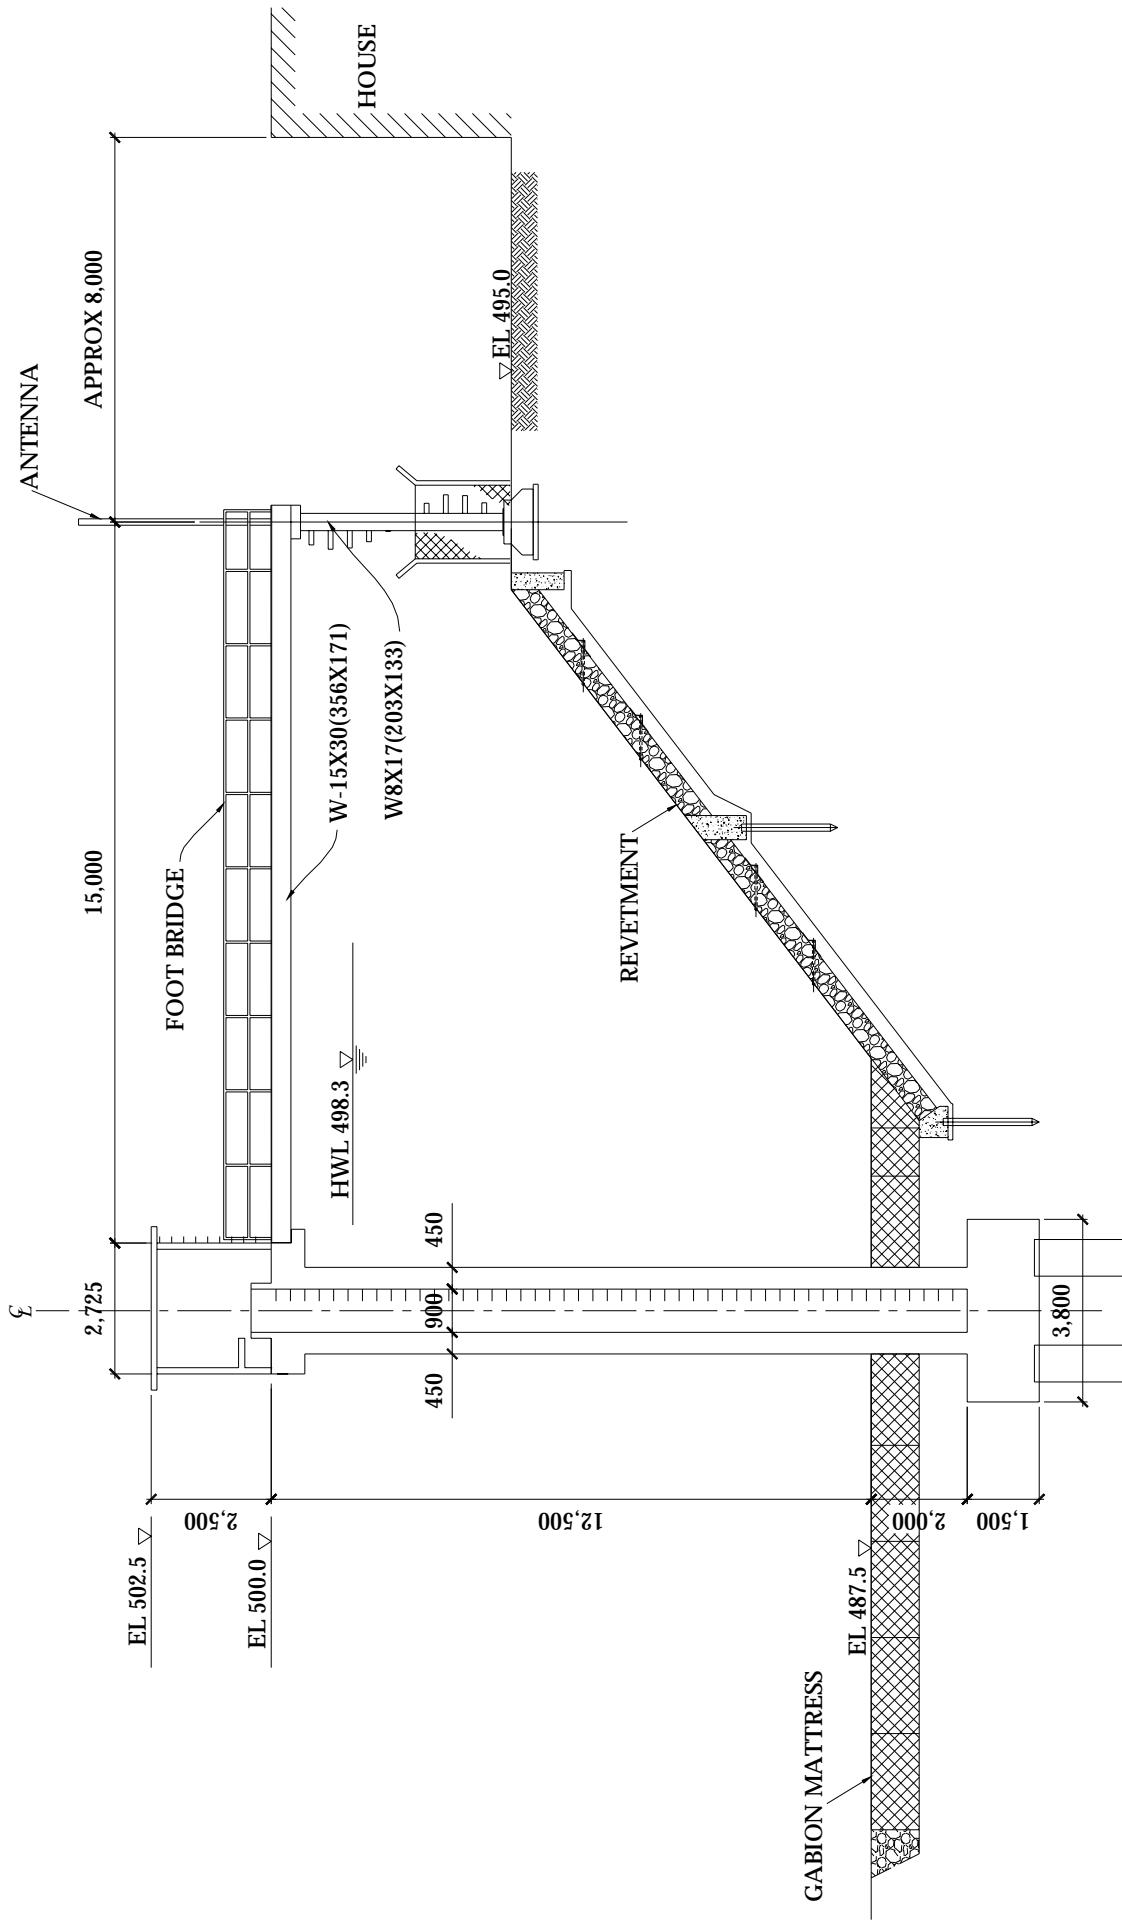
Elevation of Water-level Gauging Station (Gawa Mandi Bridge)
